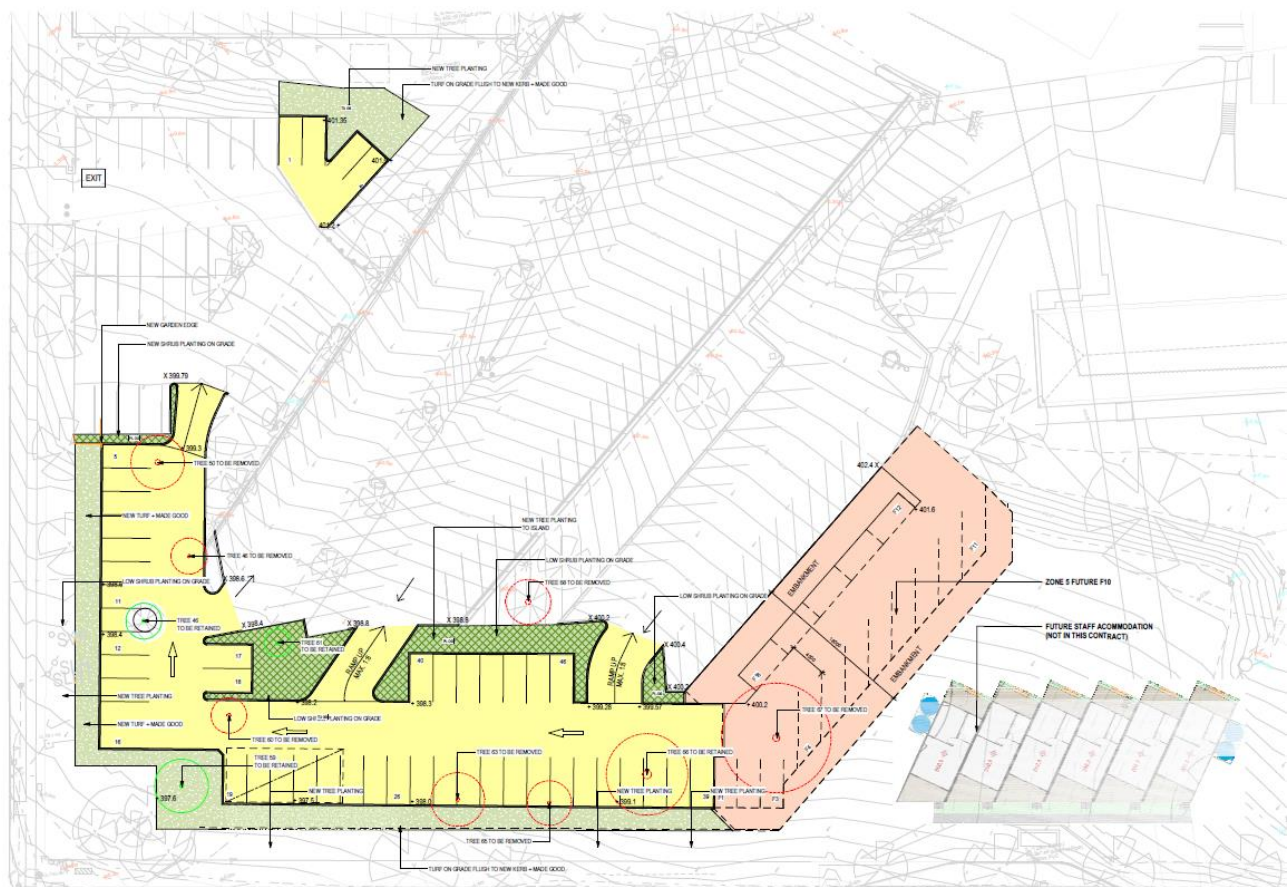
Carpark Plan South West Carpark A Zone 4.
